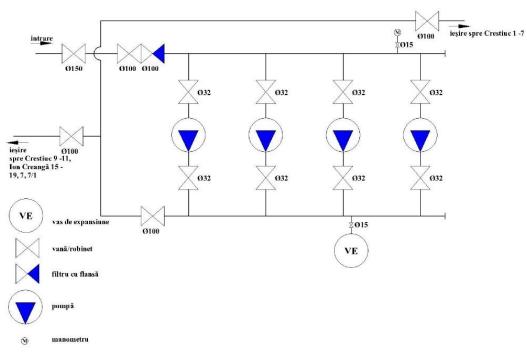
Hydraulic Scheme with existing equipment of BPS-7 – Cristiuc 11
